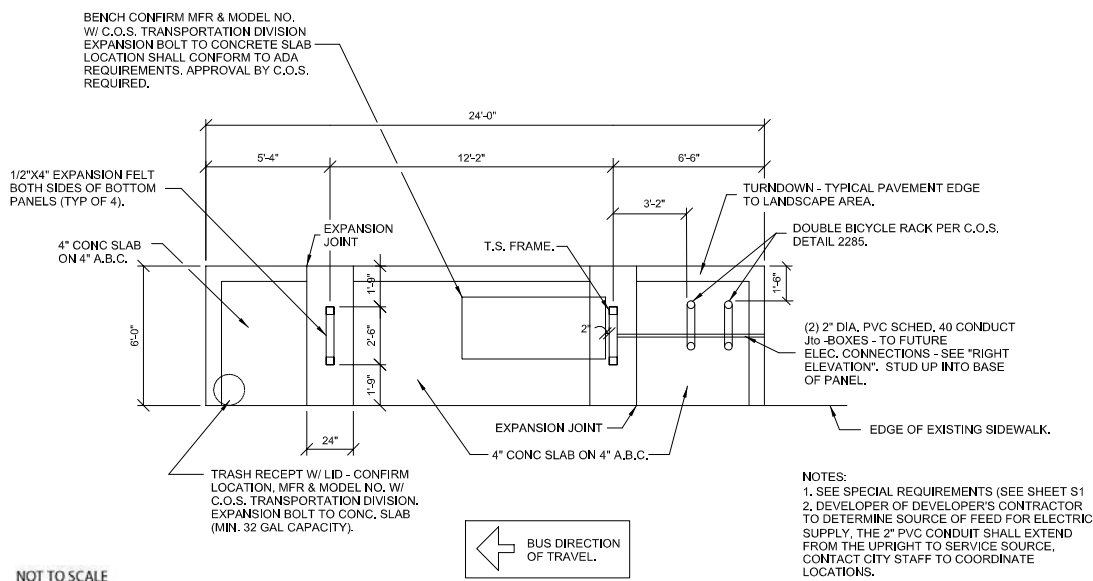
BUS SHELTER FOUNDATION PLAN
